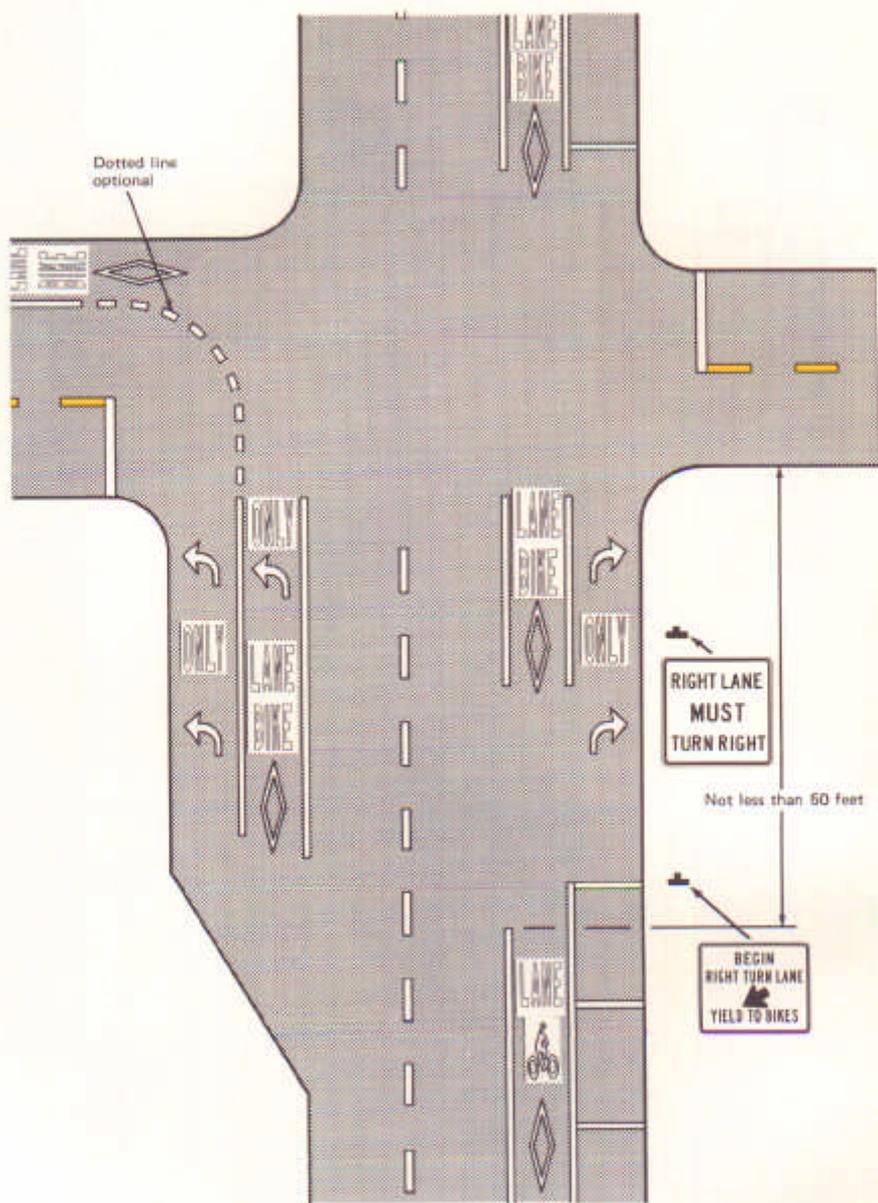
Intersection pavement markings—designated bicycle lane with left turn area, heavy turn volumes, parking, one-way traffic or divided roadway.
